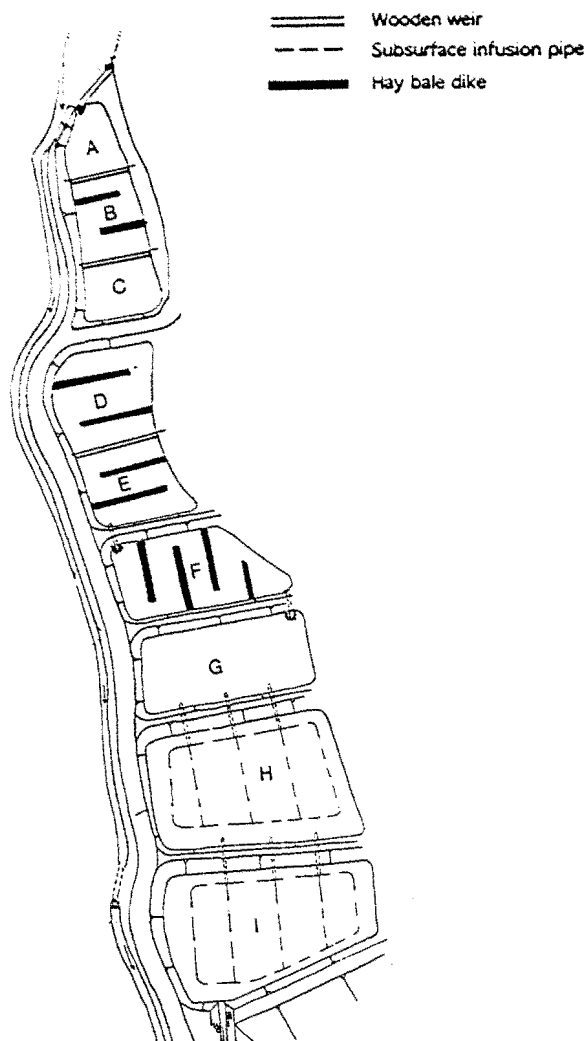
Plan view of the Lick Run mine drainage wetland.
